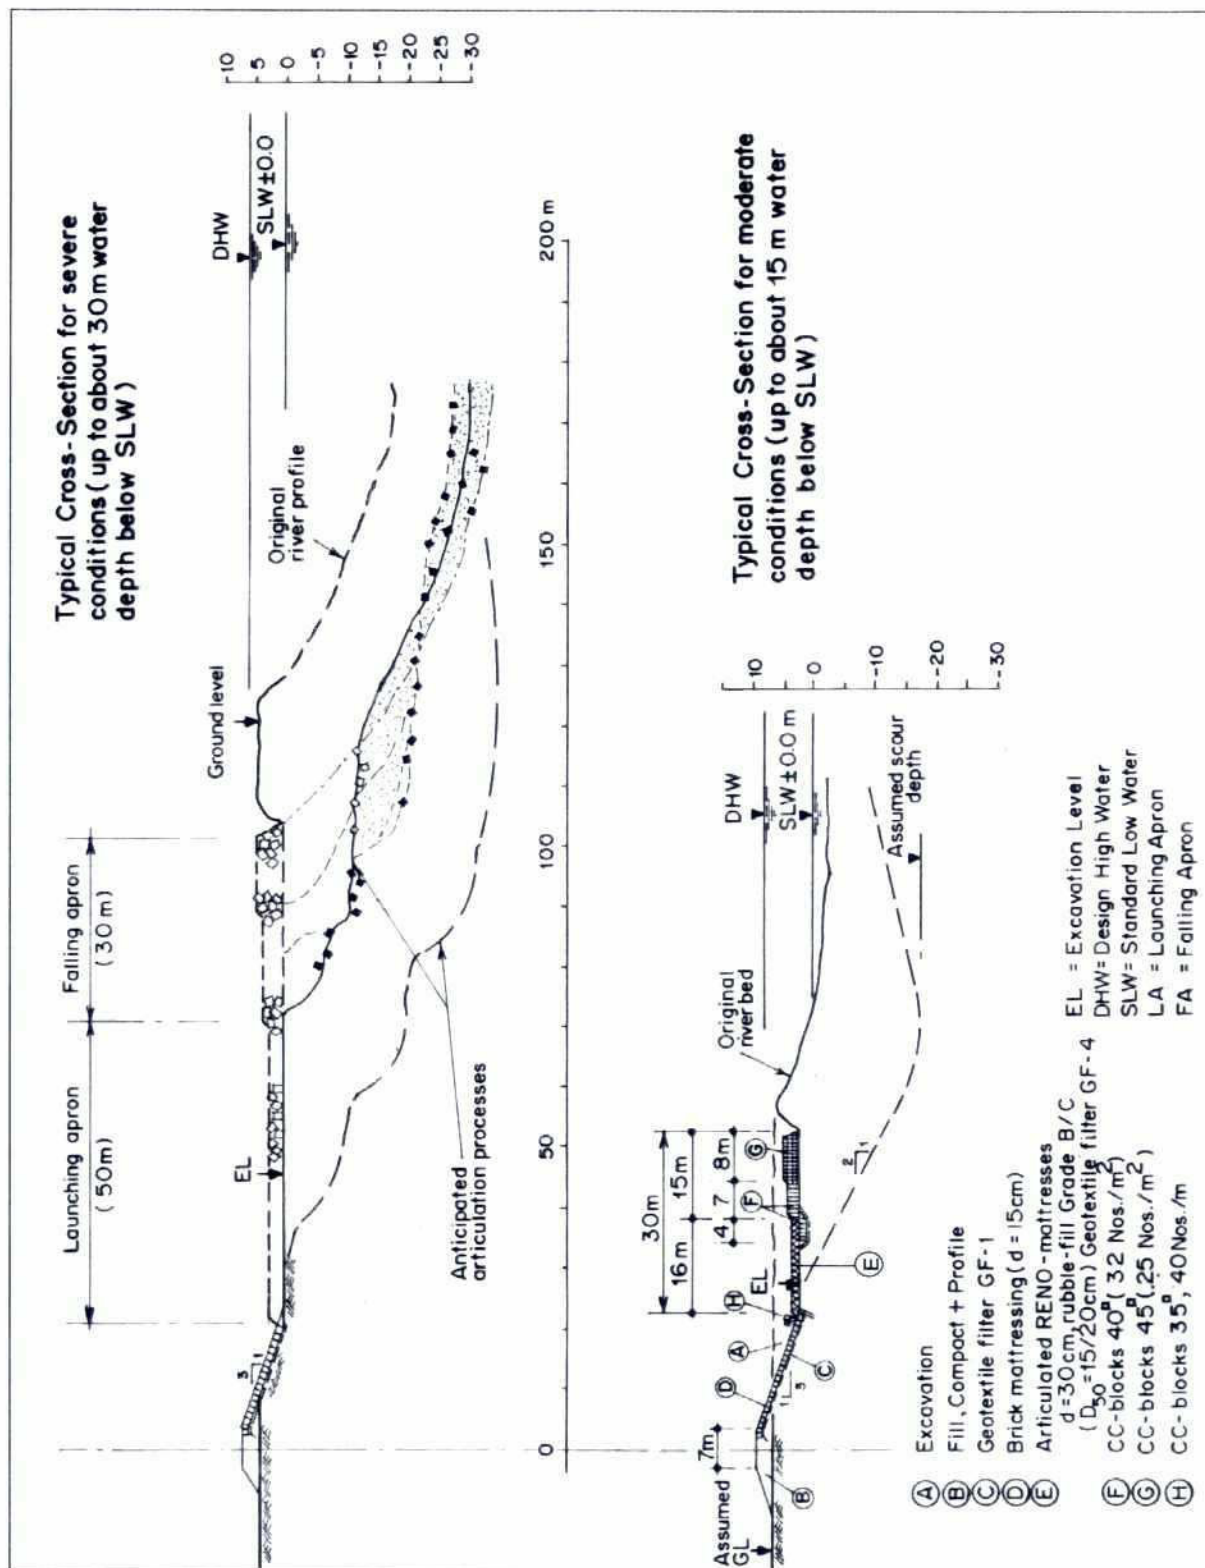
Outline of future standard cross-sections (15 m and 30 m water depth below SLW)
